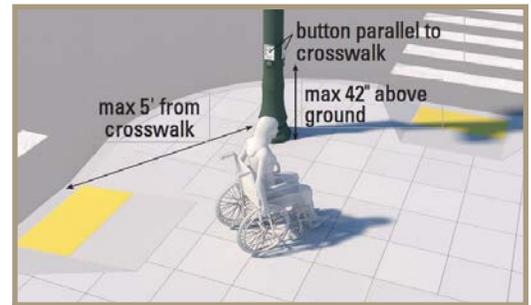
ADA-compliant curb ramp design standards. (Photo Credits: NJDOT Complete Streets Design Guide)
